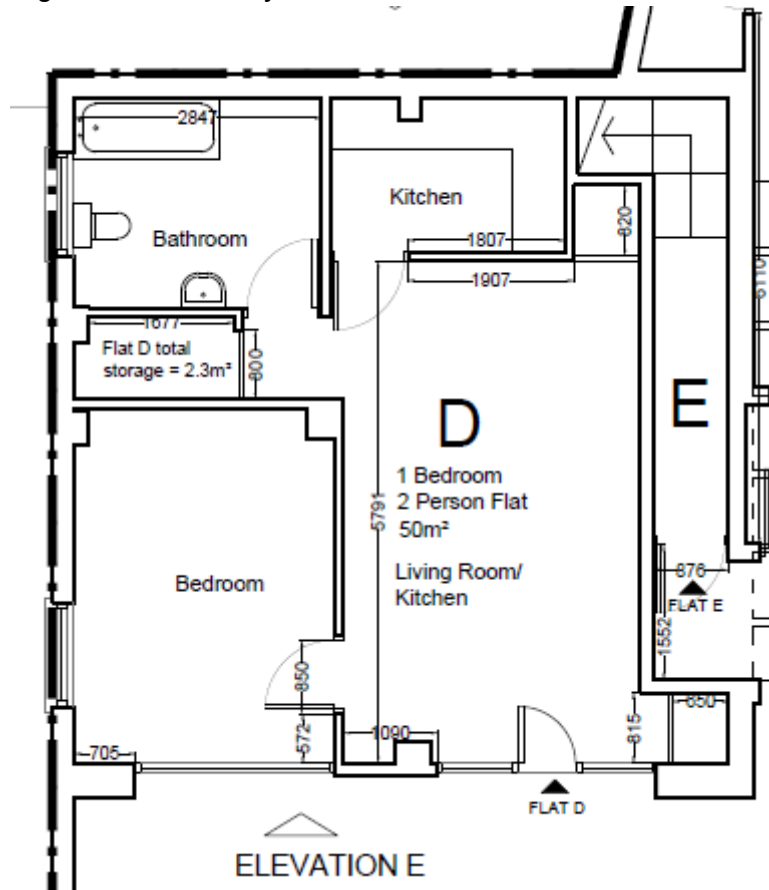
internal layout of flat D of 242 to 246 Wood Street
